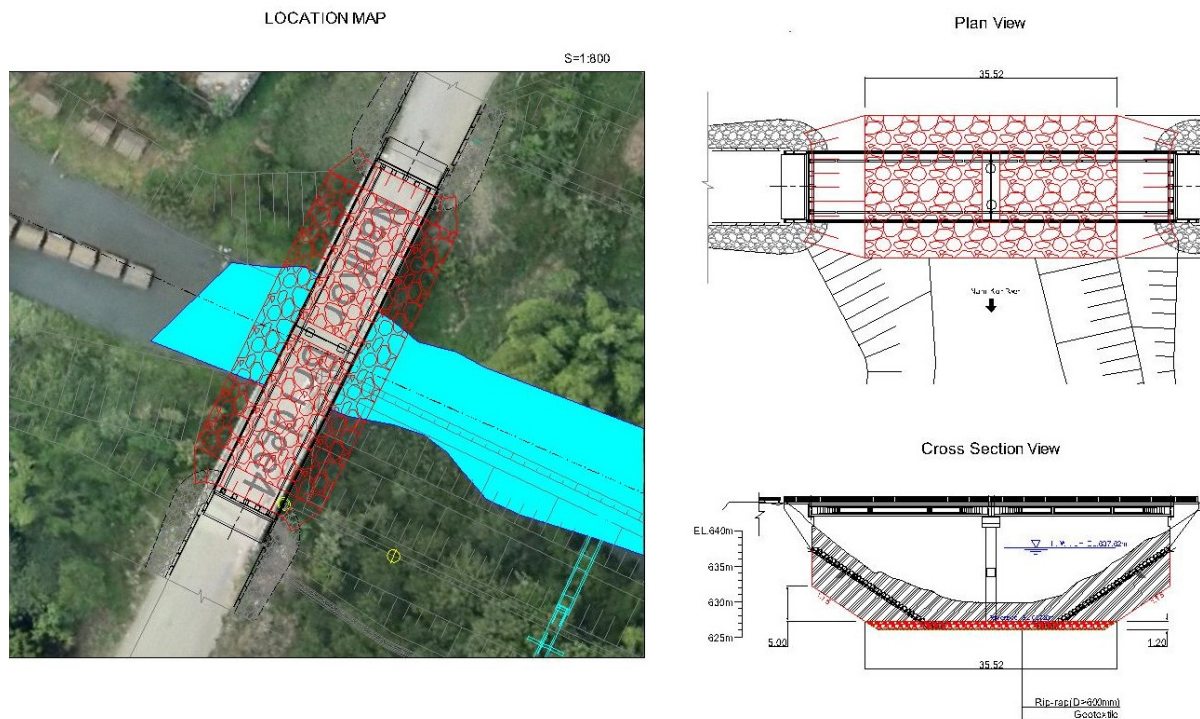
Detail Design of the Scouring Protection at Nam Kor Bridge No. 4
